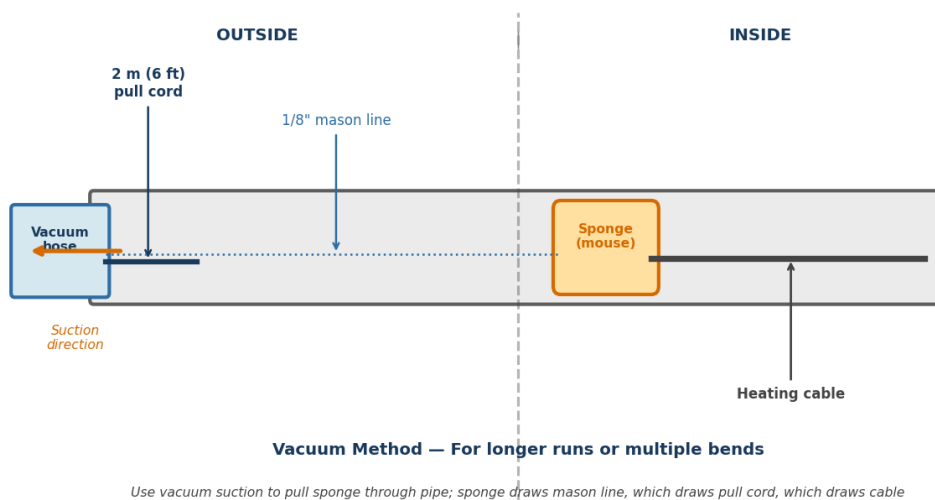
Vacuum method: vacuum suction draws sponge through pipe, pulling mason line and cable
